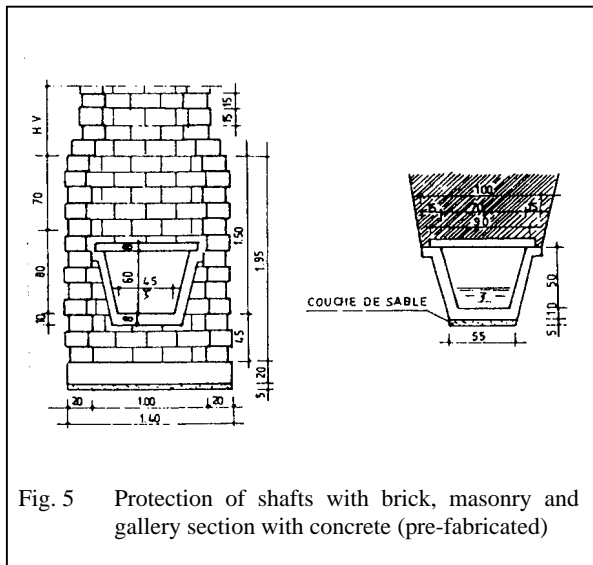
Protection of shafts with brick, masonry and gallery section with concrete (pre-fabricated)
